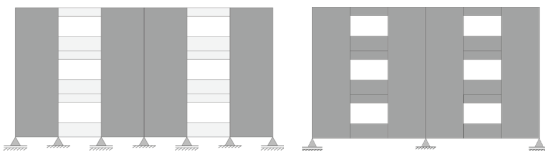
Segmentation approach in the design of timber-framed shear walls with openings (left) versus considering all parts of wall elements with openings (right).
